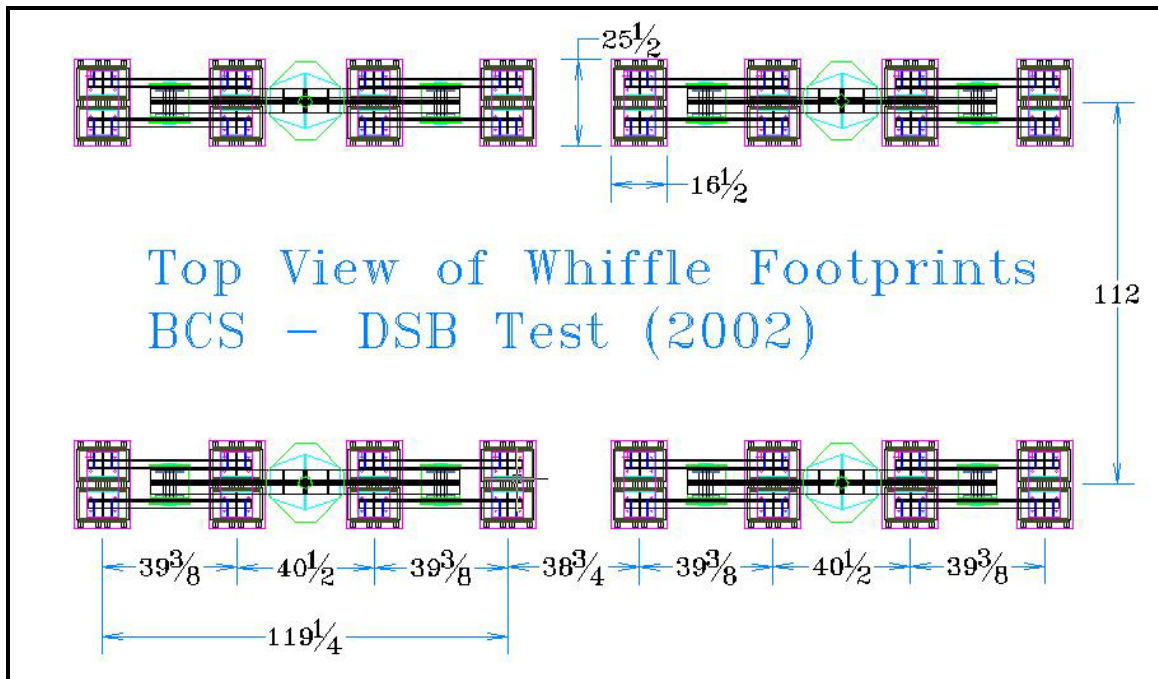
Drawing showing the contact pad spacing used during a previous test program. The contact pads and part of two whiffle assemblies are depicted, but the interconnecting whiffle assembly structure is not shown. The eight pads on the left (or right) side are connected to one whiffle assembly. The bridge would be oriented left-to-right under the whiffles. Dimensions are in inches.
